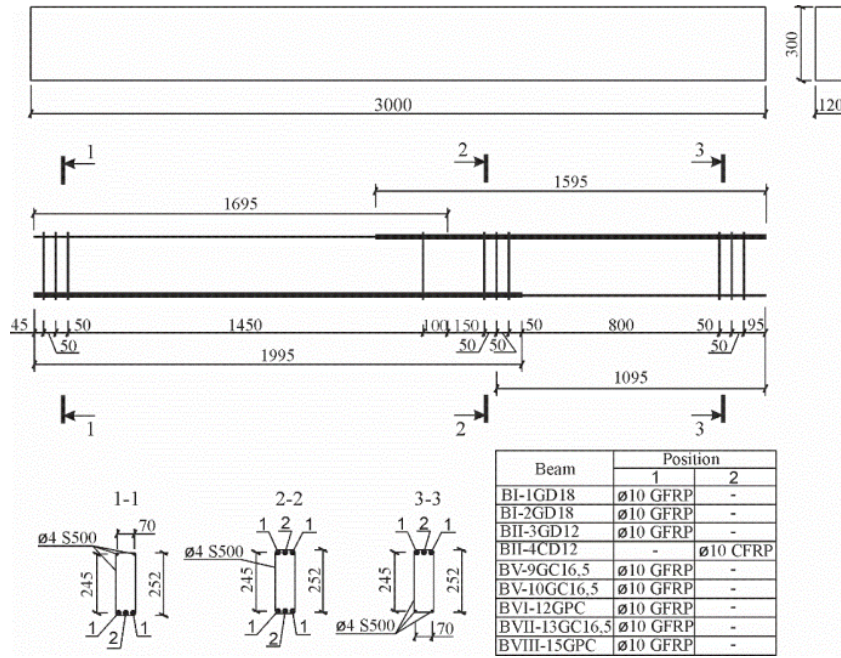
Geometry, reinforcement arrangement and parameters of tested beams [27]
